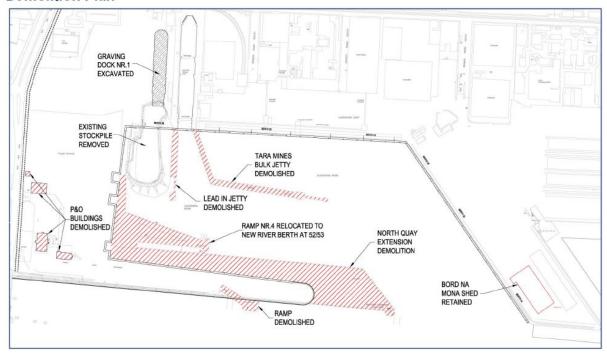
Proposed demolition plan of P&O Buildings, Dublin Port.
